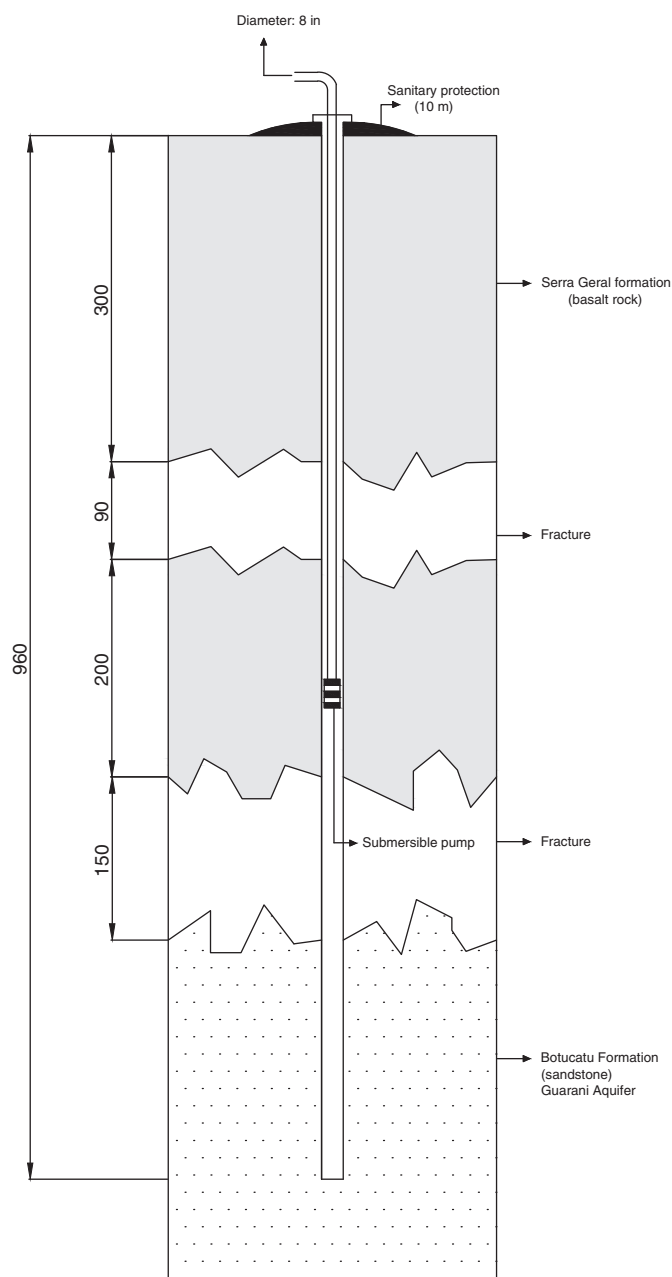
Schematic drawing of the well drilled in the Guarani Aquifer.
